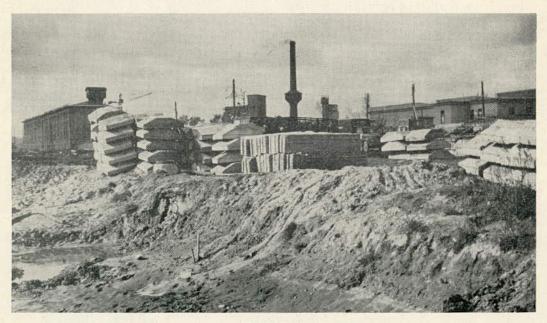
Frecast footings for apartment buildings, Leningrad.
